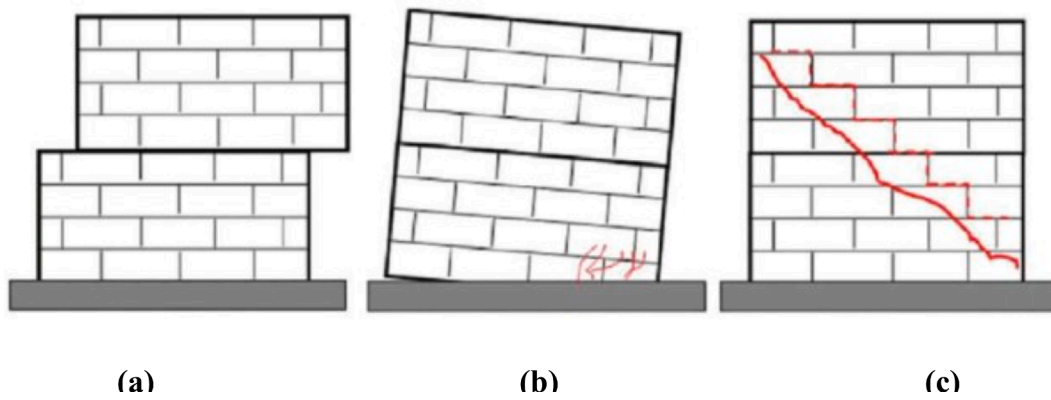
Masonry wall in-plane failure types typically include: (a) sliding shear failure; (b) rocking; and (c) diagonal cracking [16].
